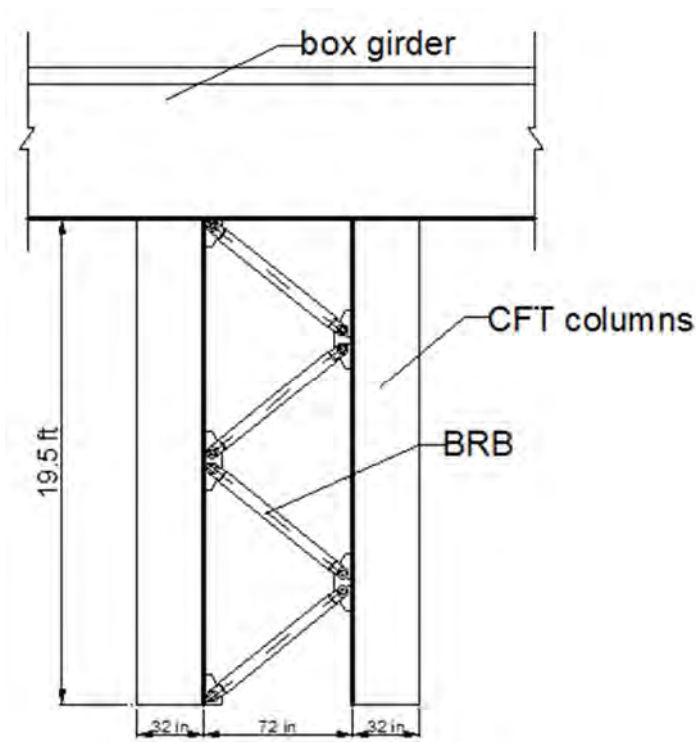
Longitudinal bridge bent with inserted BRBs
